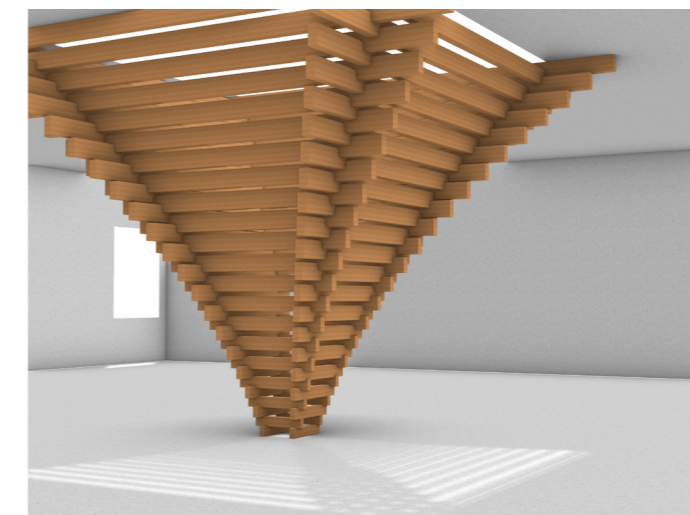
Discrete timber column with roof light (own work, 2024)
